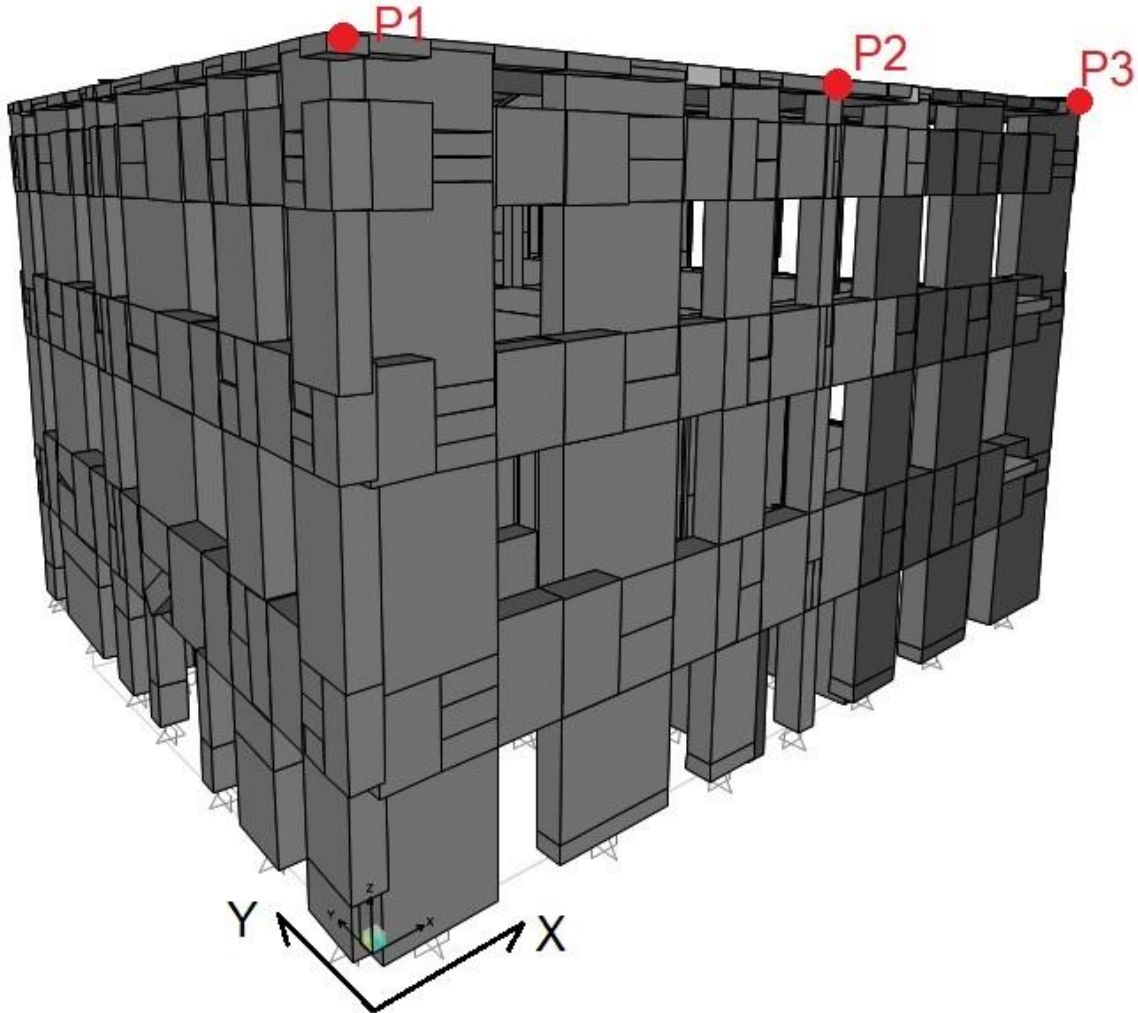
Structural FEM model of the Villa and control points on the top floor (Sap2000).
